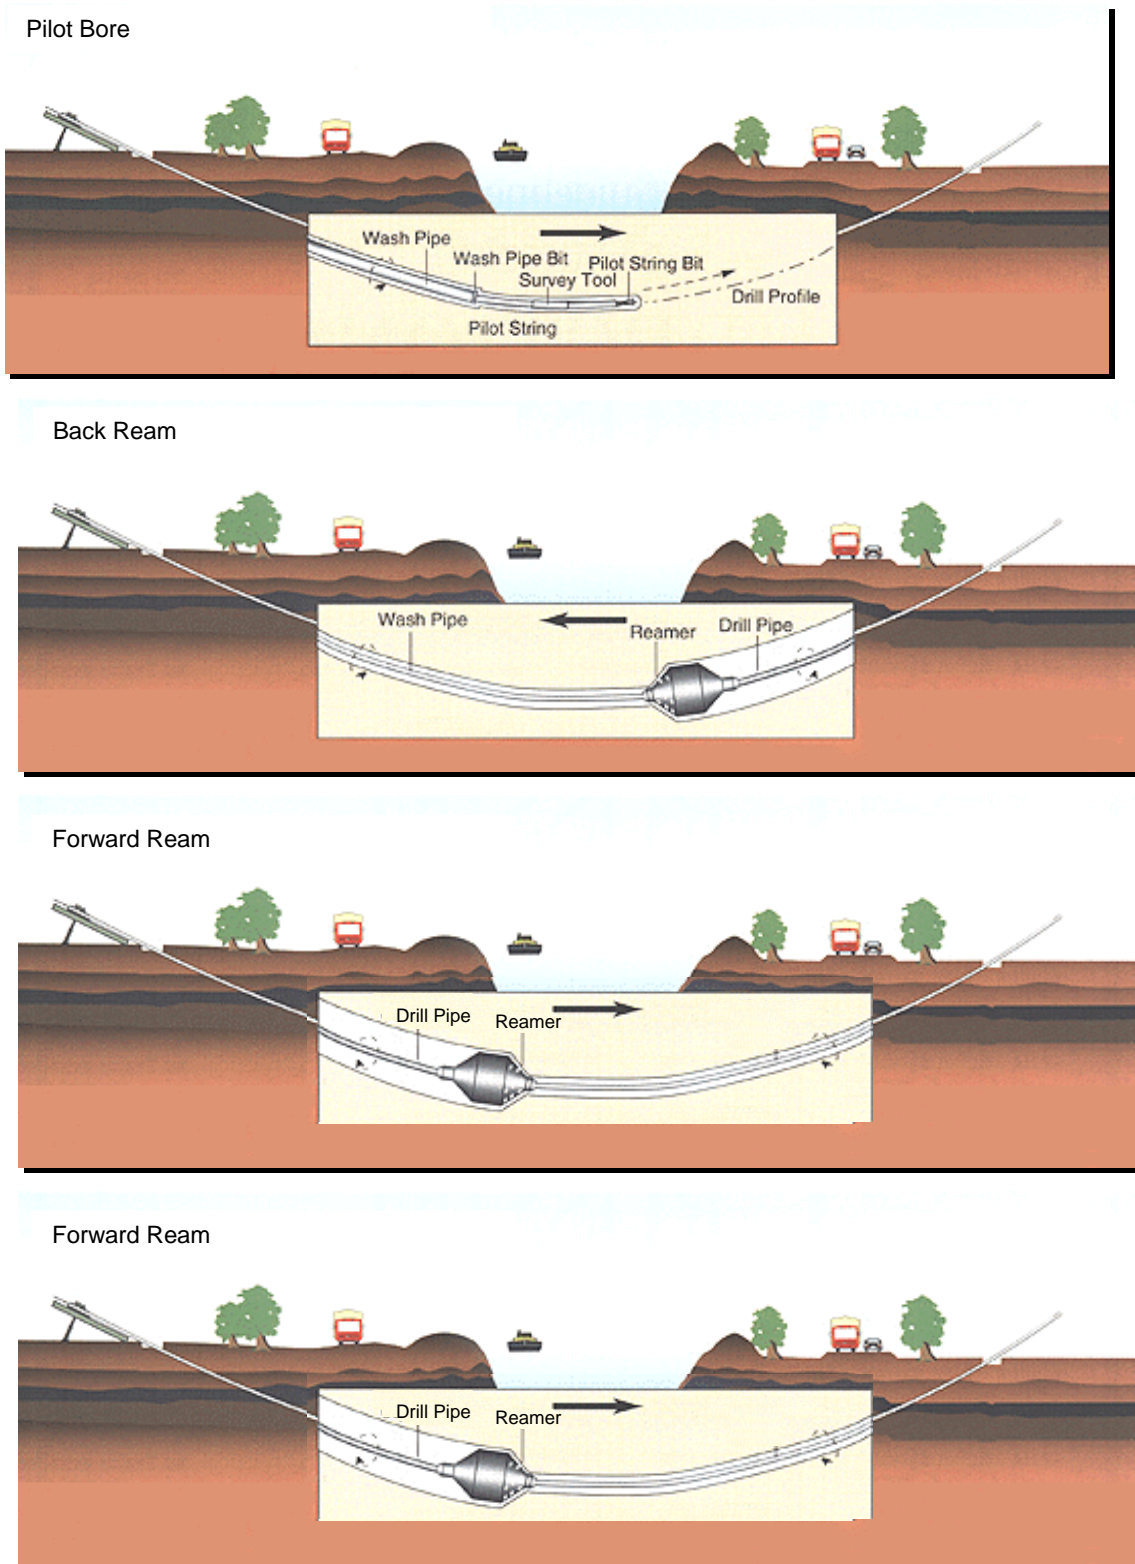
Horizontal Directional Drilling Installation Process (Courtesy of DCCA)
